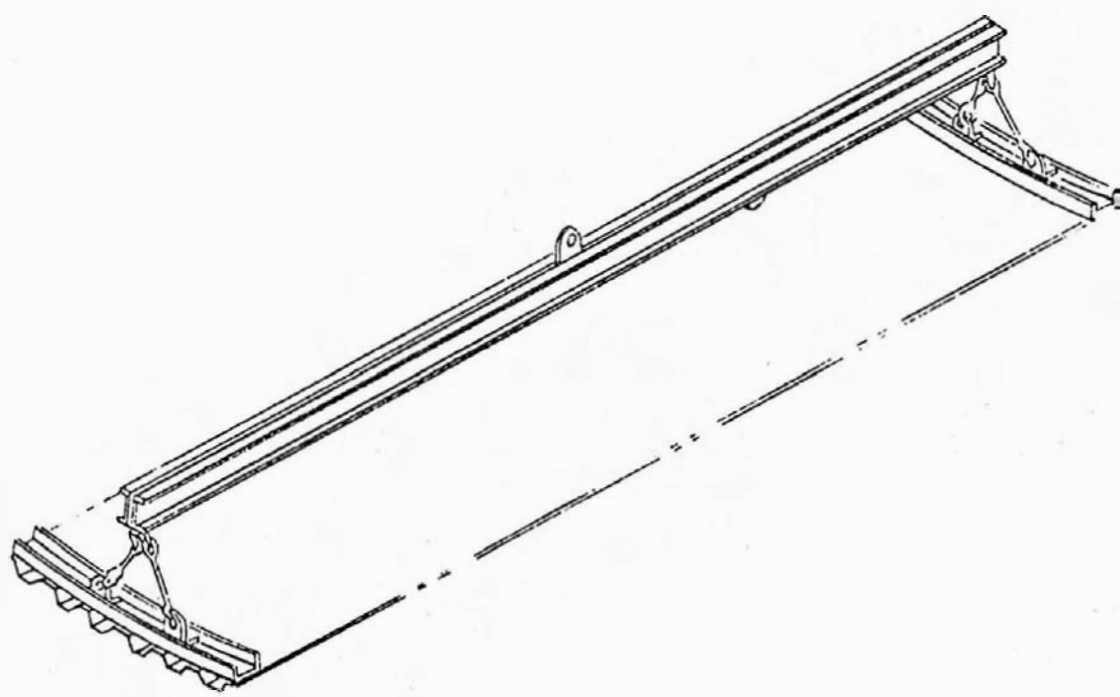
Single Skin Panel Handling Tool HT-370-28205
